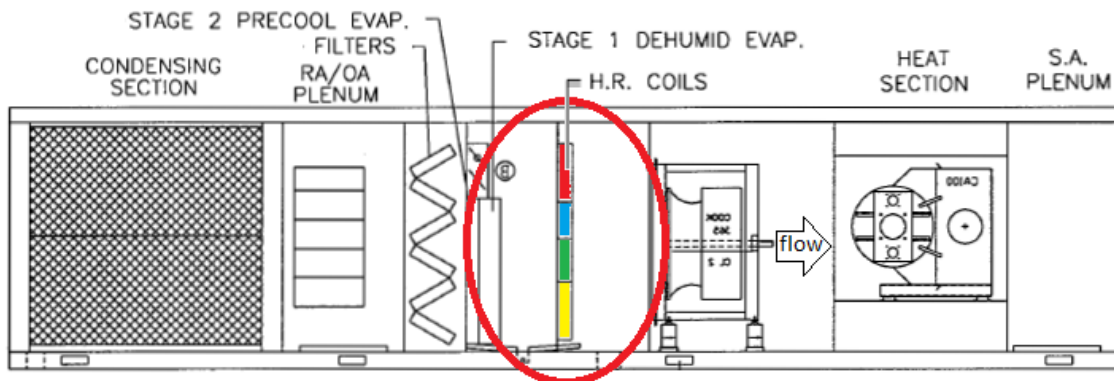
SCHEMATIC DRAWING OF AIR HANDLING UNIT, SHOWING 4-CIRCUIT HEAT RECOVERY COIL
